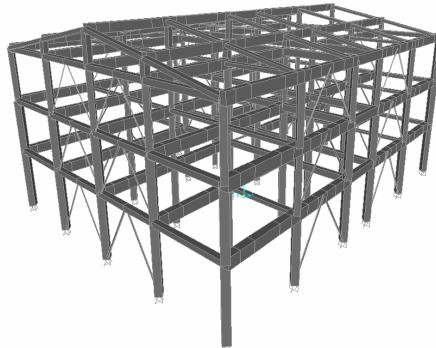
Reference non-seismic designed reinforced concrete frame building.
